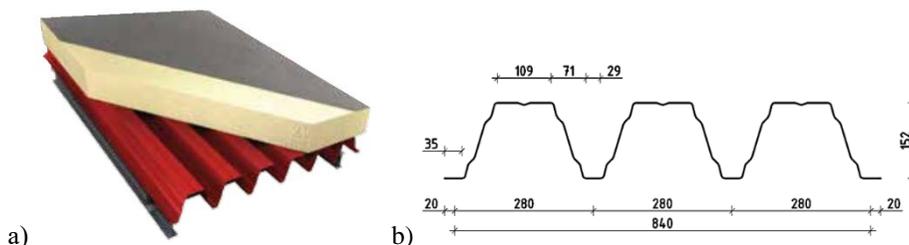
Trapezoidal sheet 150/280; a) detail of the ceiling of modern industrial objects (TR sheet, thermal insulation and roof cladding) [1], b) geometry.
